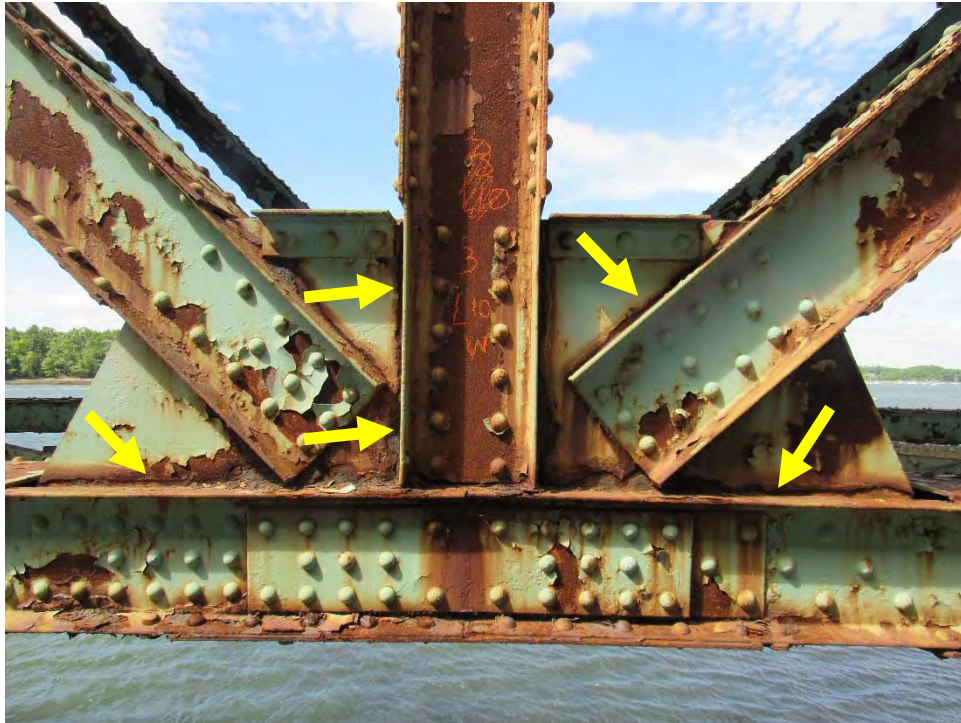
Span 3 Gusset Plate – Section Losses Along Member Connections
